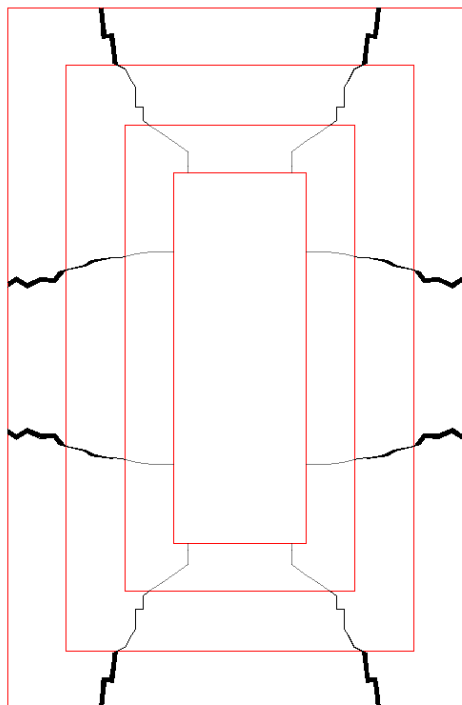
Differential Cracking of ASR affected Concrete Beam Section, Courtier (1990) & ISE (1992)
